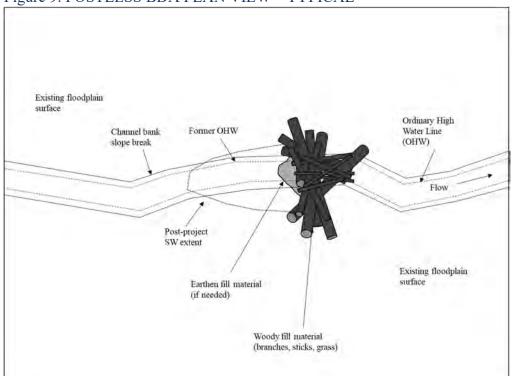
POSTLESS BDA PLAN VIEW – TYPICAL
